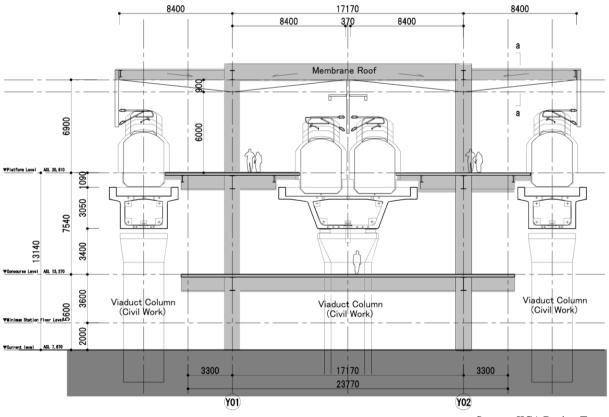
Station Cross Section (Island- Type Platform)
